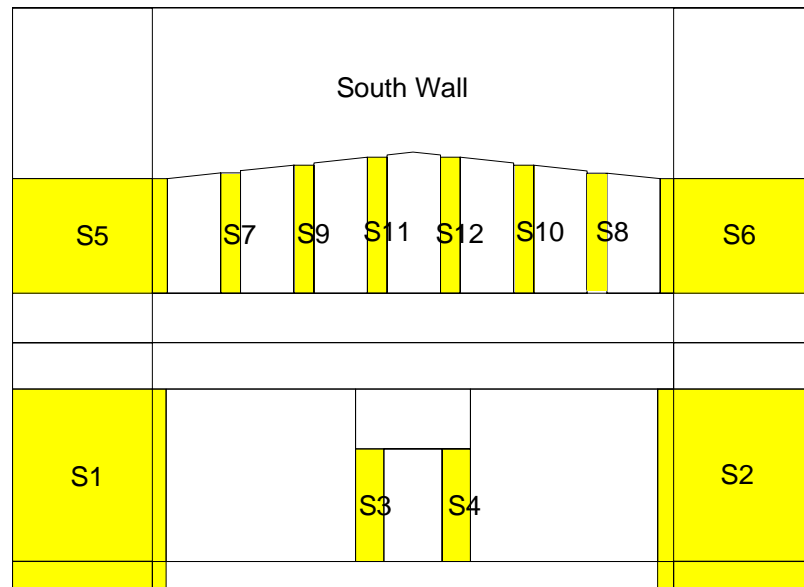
Piers of south wall using the pier-type collapse mechanism.
